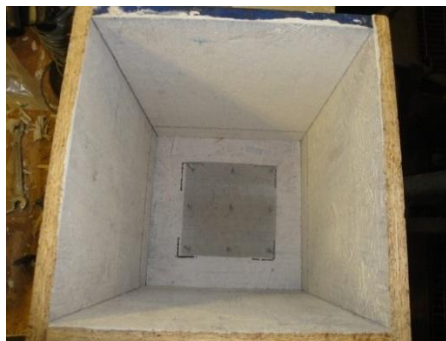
Screws in the base of the form to elevate the reservoir for concrete casting
